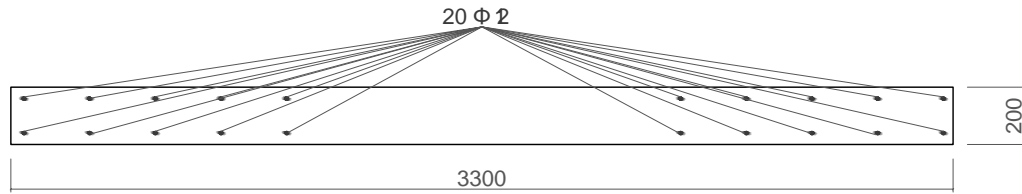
Geometry and reinforcement arrangement of shear wall
